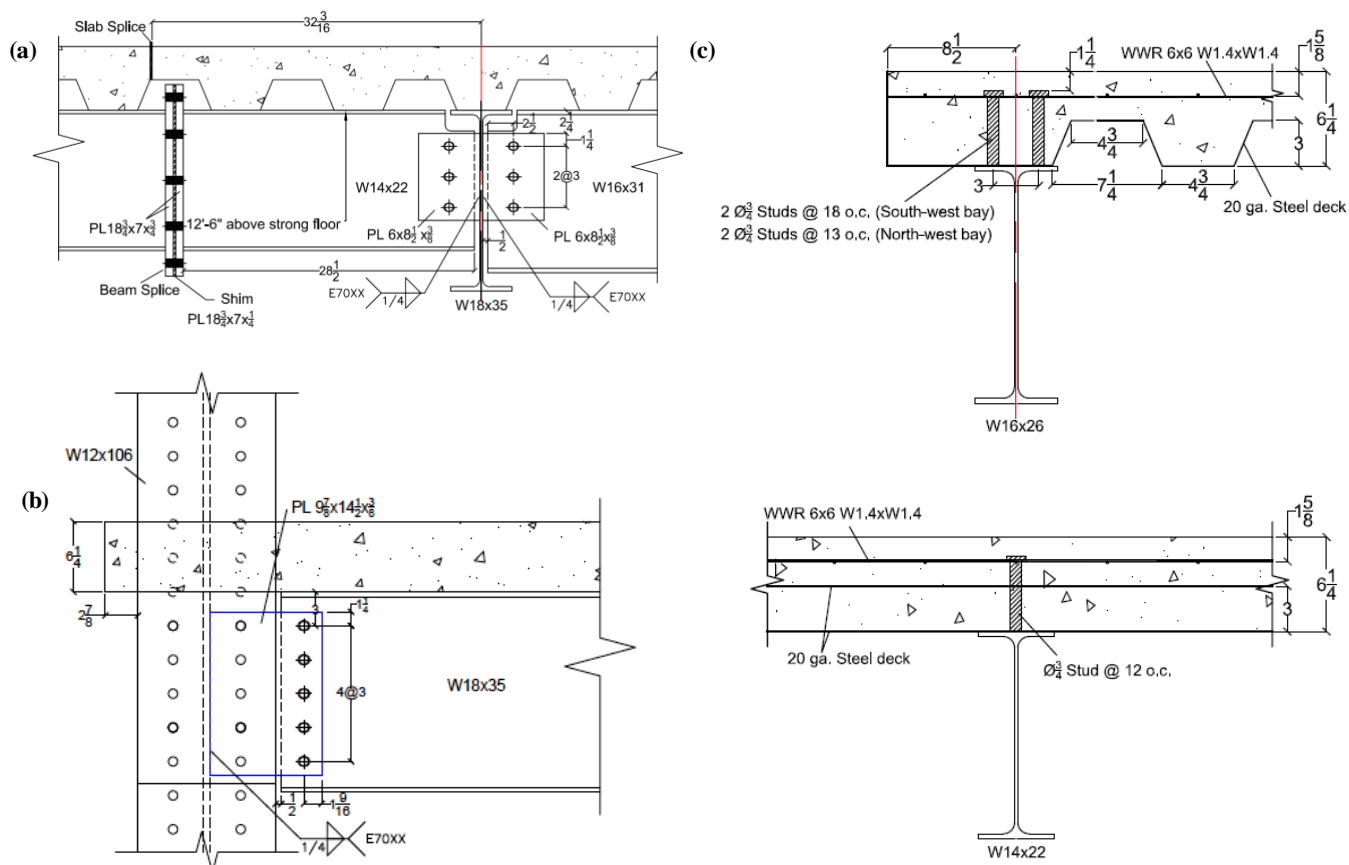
Details of (a) Standard shear-tab connection; (b) Extended shear-tab connection; (c) Composite sections. Dimensions in inch (1 in. = 2.54 cm)
